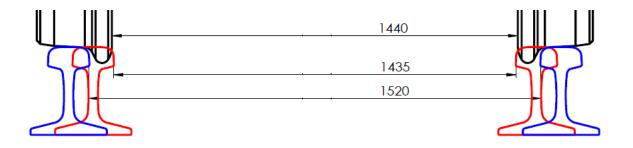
Symmetrical layout, wider gauge wheel-set, P50 profile rails
